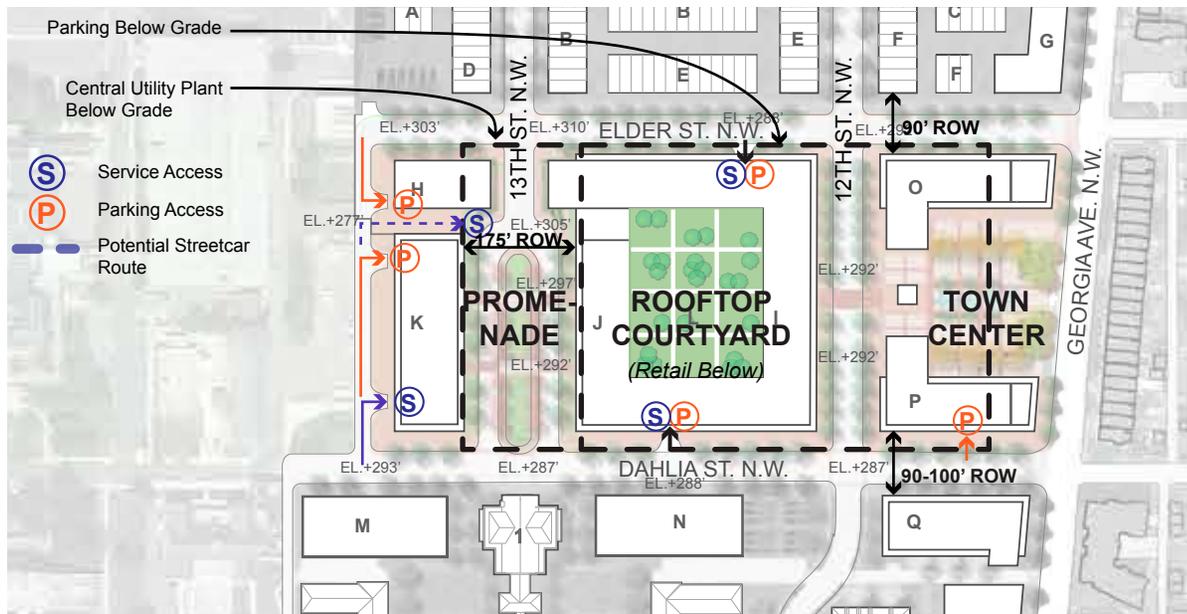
Sub-Area Plan 2. Source: Perkins+Will.
